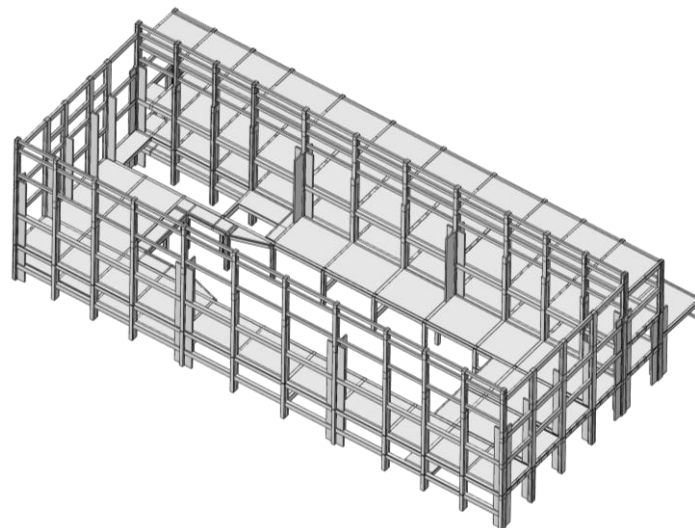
The structural effect diagram of the main building structure of the few-wall SRC frame-bent structure.
